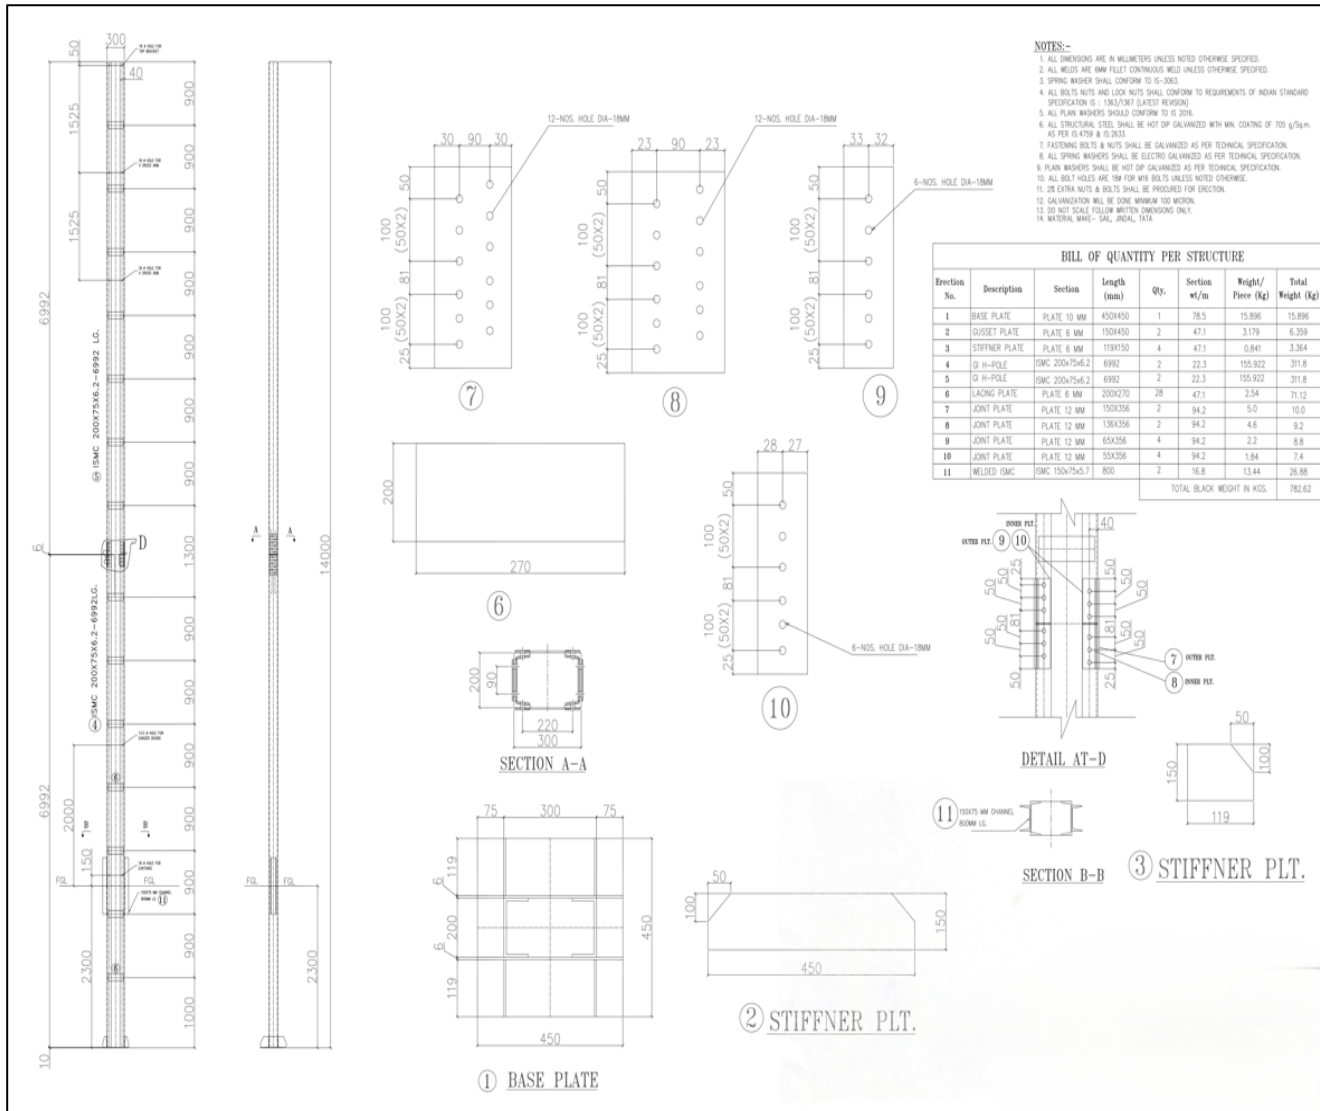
13 Mtr. H POLE (Single piece) Drawing
